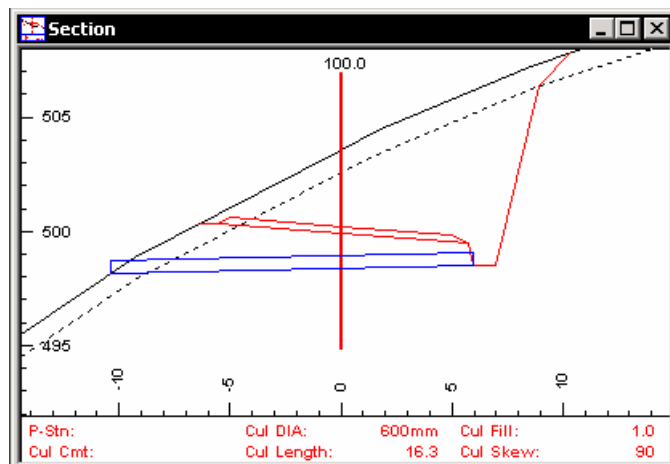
A Cross Drain Culvert with Ditch Template Override
